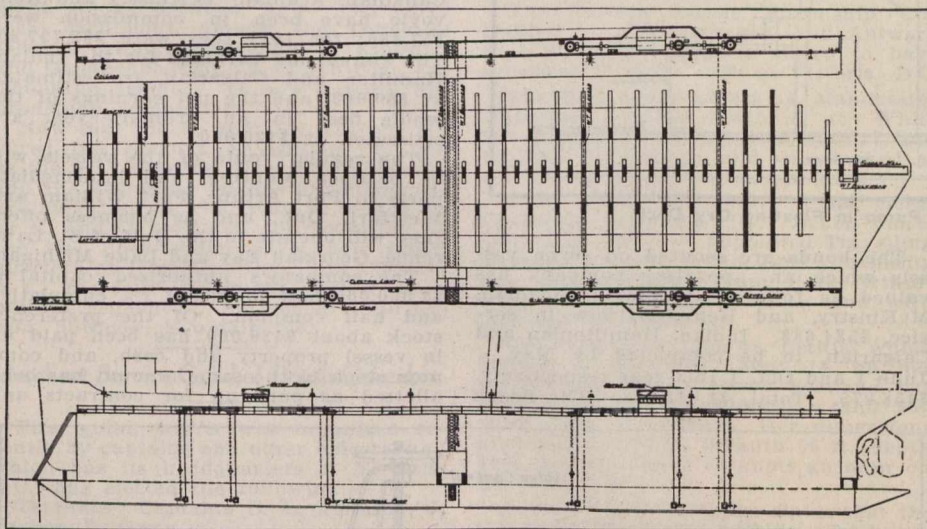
Plan and Side Elevation of Floating Dry Dock.
